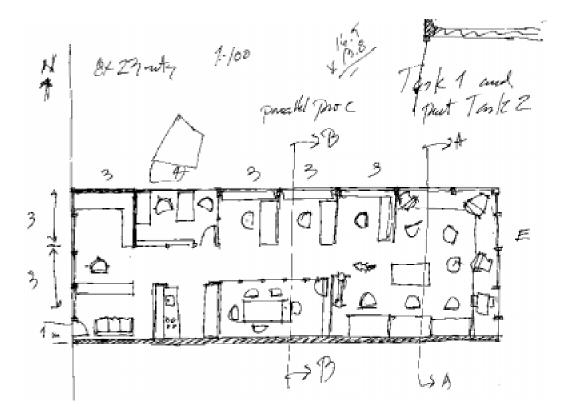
Mario's second floor plan has columns traced on top of last layer (Figure 5- 20, Task 1)
